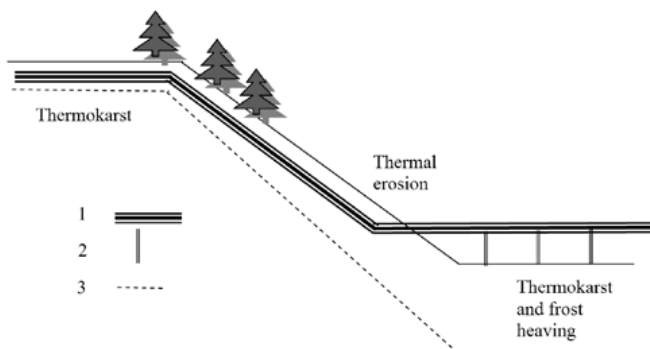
Generalized scheme of longitudinal cross-section of nature-engineering system of the pipeline corridor: 1 – Pipe, 2 – Pile, 3 – Border of rock deposits.
